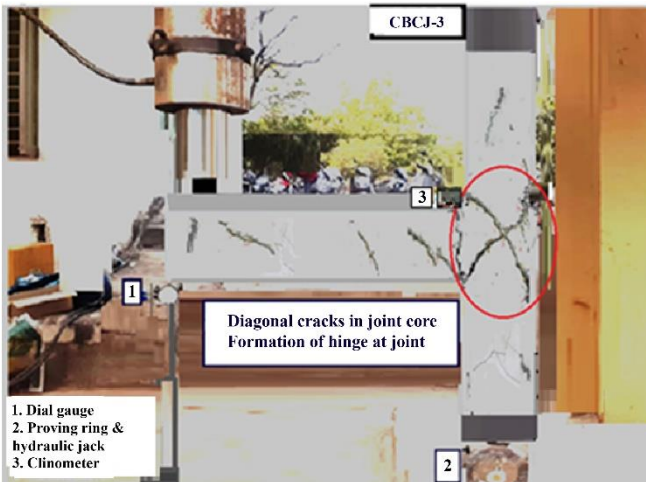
(a) Testing of conventional 180 degree hook anchorage CBCJ3
